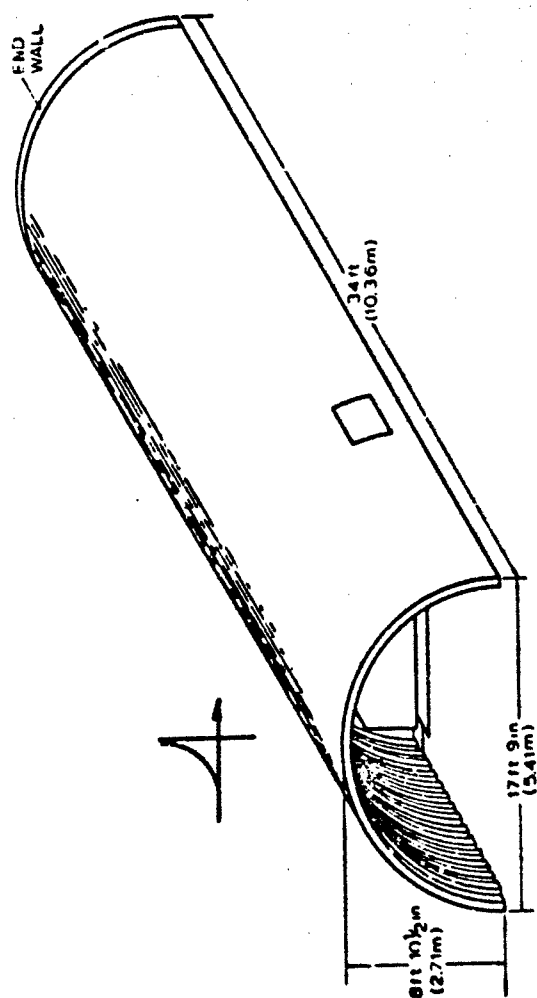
First Generation (TAB VEE) Shelter Arch - Shelter "B", Scaled
